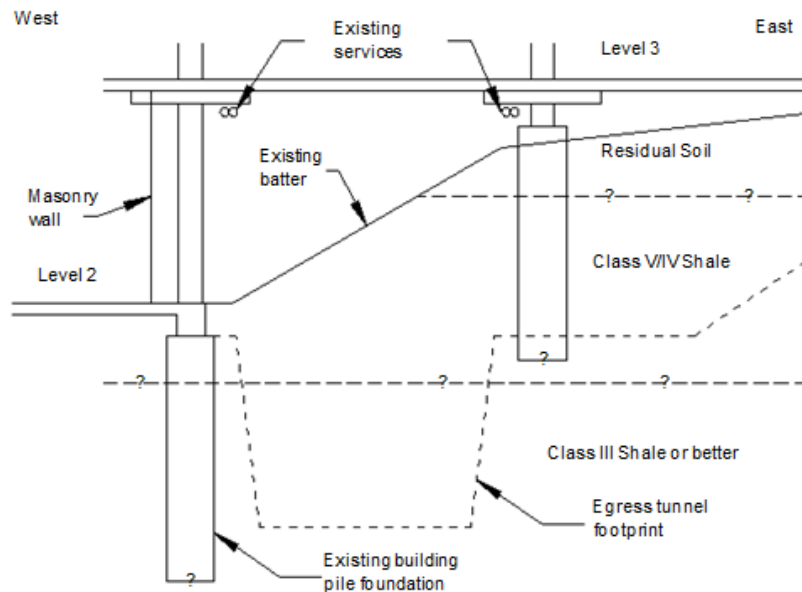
Cross section showing summary of encountered subsurface and existing conditions
